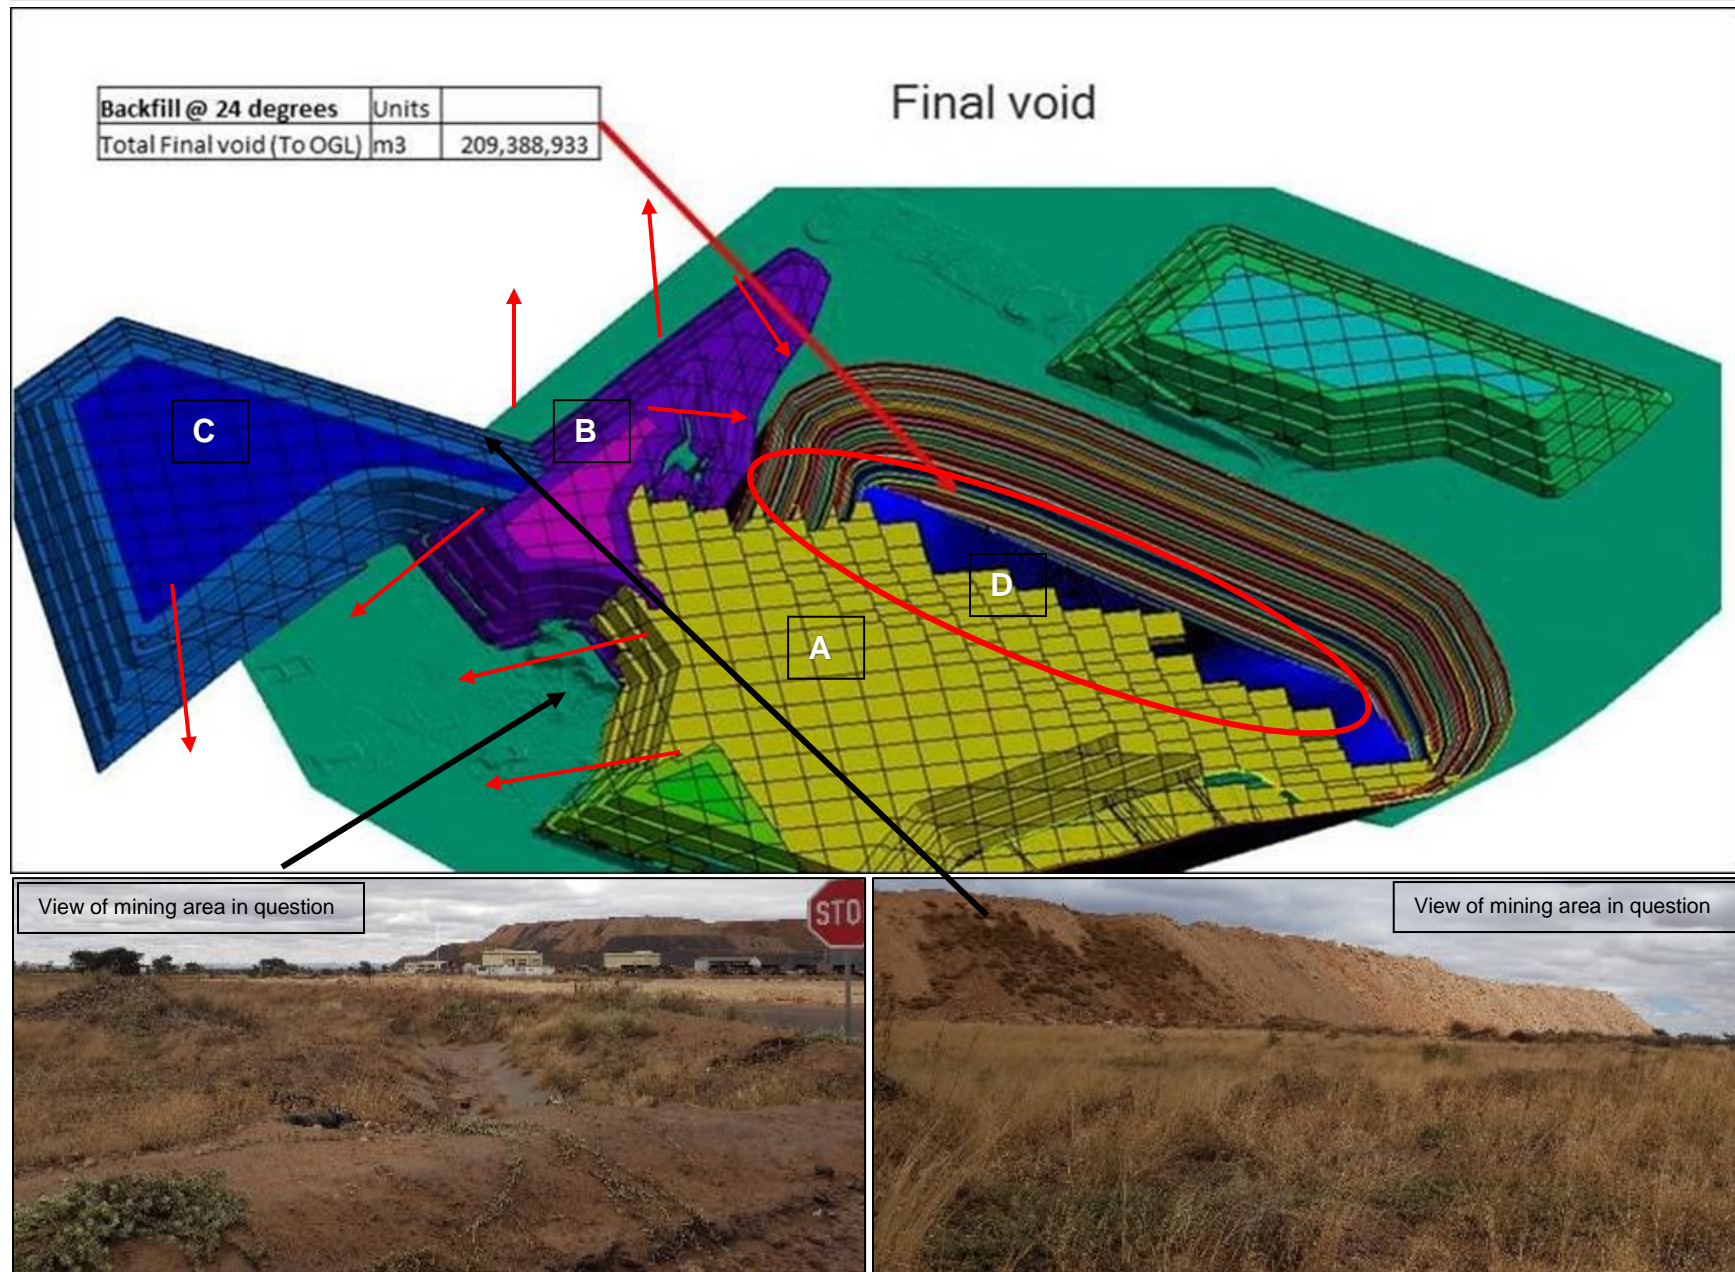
Conceptual layout of concurrent backfilling with arrows indicating recommended additional landscape smoothing.
